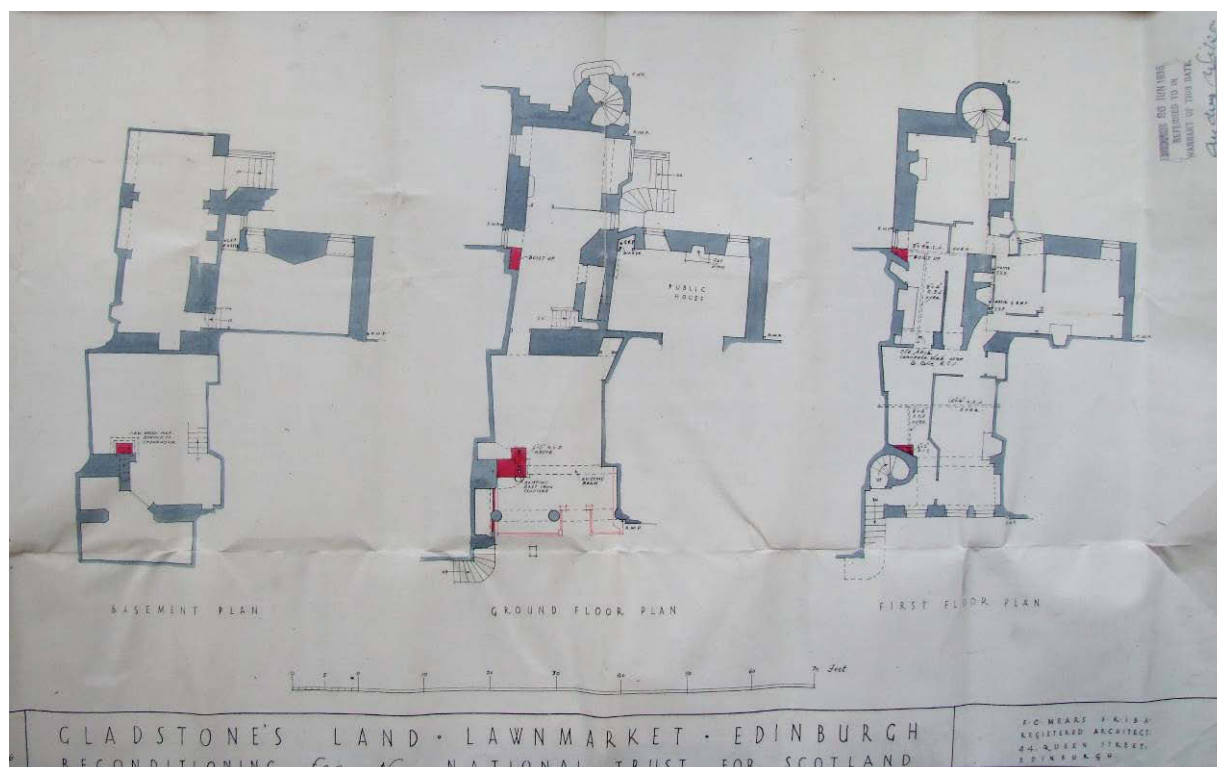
Plans showing warranted alterations for basement, ground and first floor. The full set of drawings in this application shows work warranted but not carried out. Application to Dean of Guild dated 3rd July 1936. City of Edinburgh plan store
